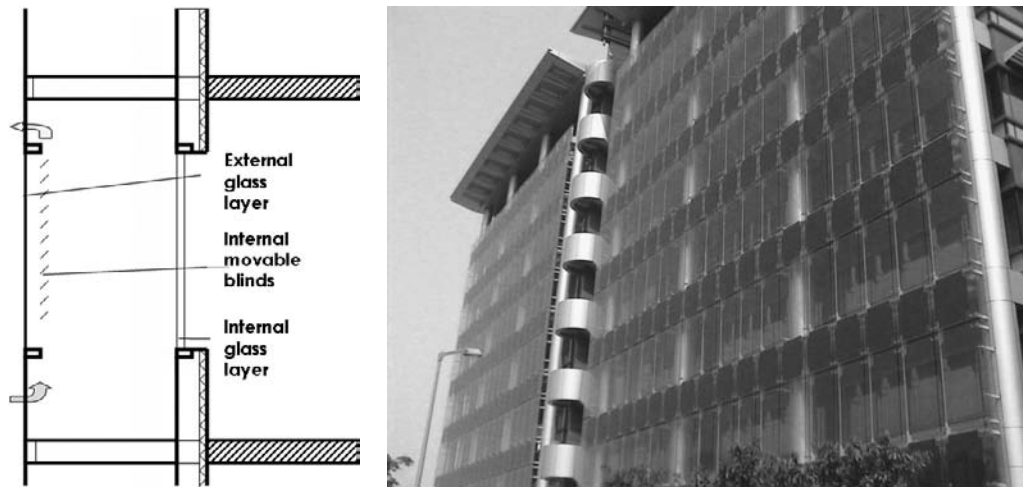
B. Façade detail of double-skin façade (DSF) and example of a building in HK (Building 5, HK Science & Technology Park (Phase 2), built in 2002, architect: Simon Kwan & Associates Ltd.) (Haase and Amato 2006a).
